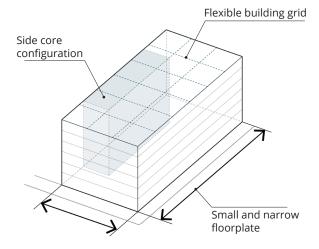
Designs that optimize the flexibility and future use opportunities of a building are encouraged. A smaller and narrower floorplate, adaptable building grid, and side-core configuration can create efficient and flexible layouts for a mix of uses.
